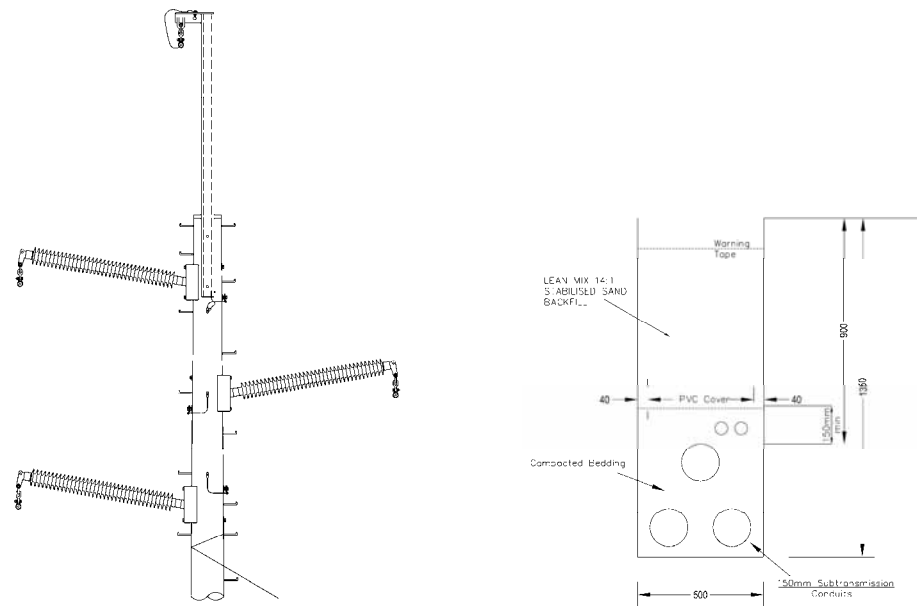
Proposed Overhead and Underground Construction (Typical)
